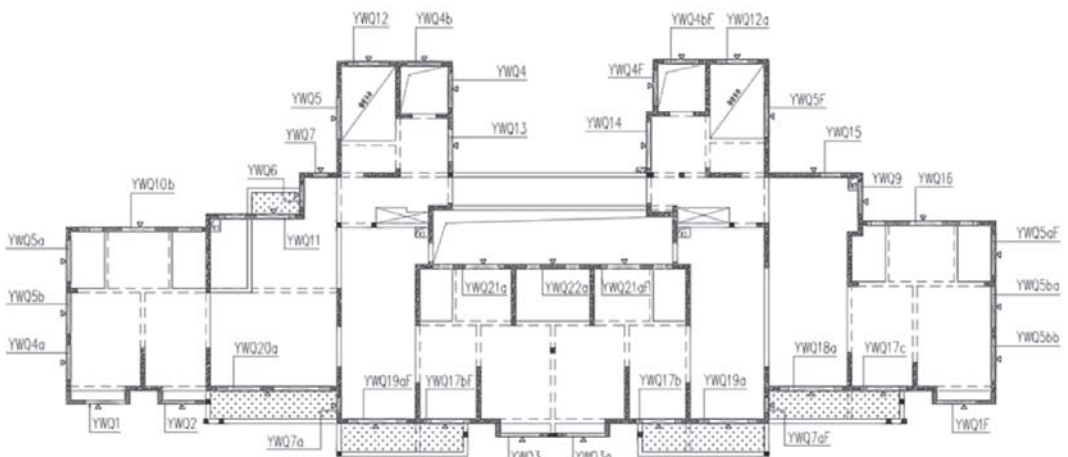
Plan of vertical prefabricated components of buildings #6 and #7.
